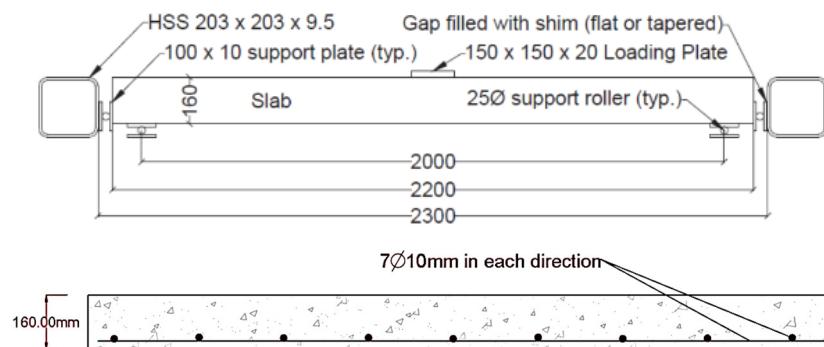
Geometrical parameters and reinforcement details of two way reinforced concrete slab
